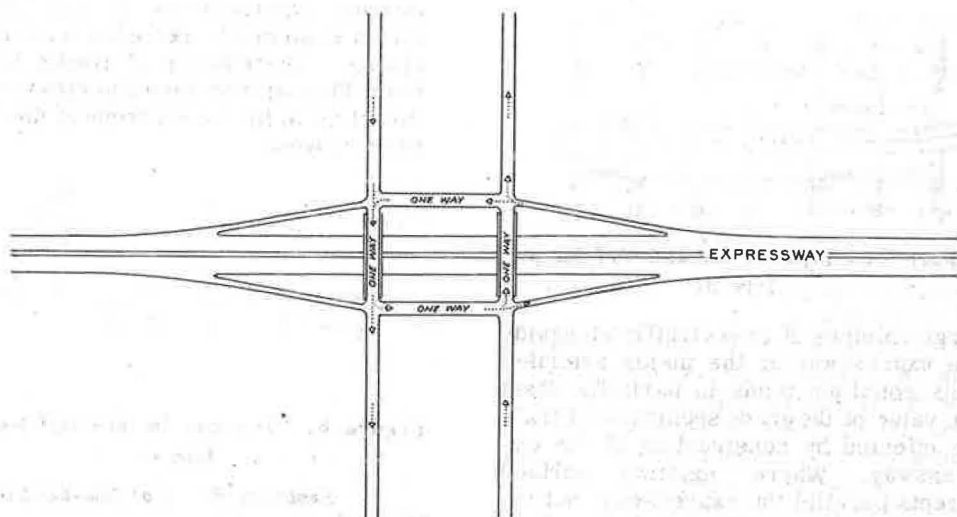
Typical Ramp System at Intersection with Pair of One-Way Streets - Type f.
